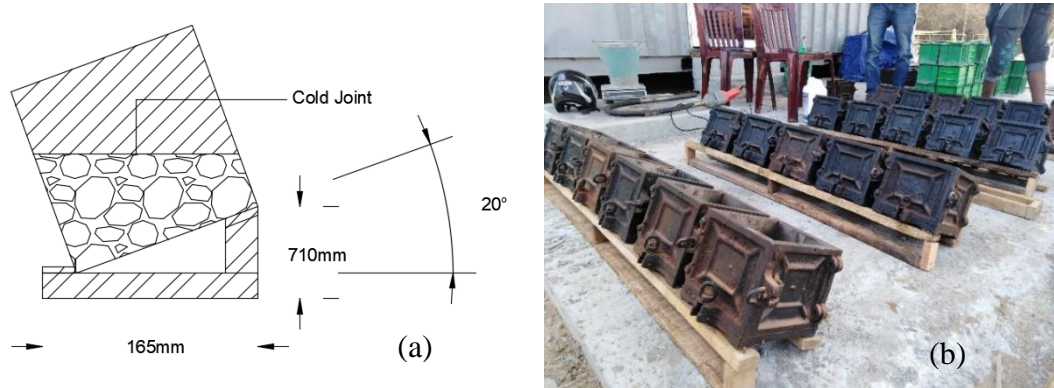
Wooden frame for making cold joint in an angle plane: (a) Schematic diagram; (b) Preparation of moulds arrangement for compressive strength test
